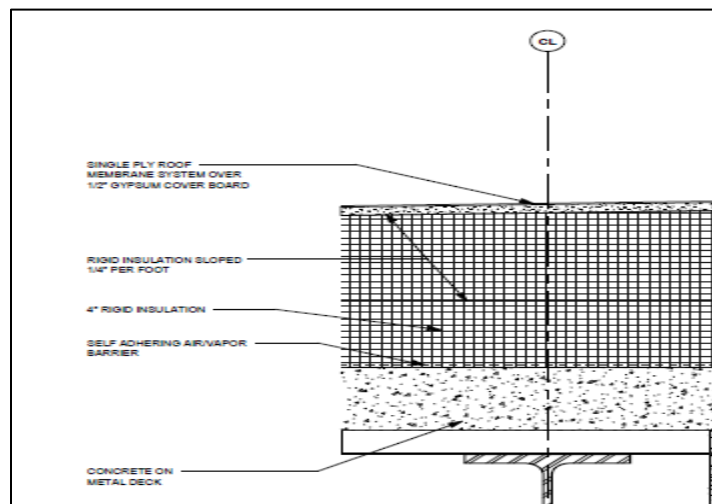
Sectional view of the roofing. Image Courtesy of BCJ
